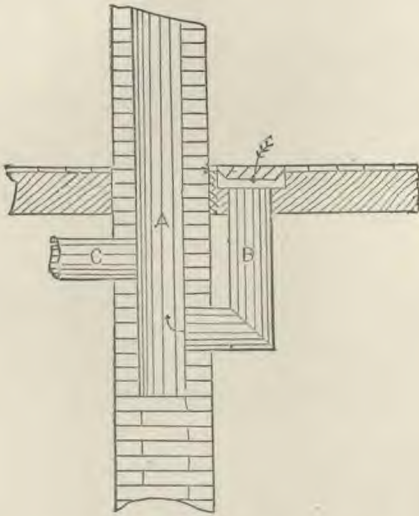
Ventilating a church by connecting an opening in the floor with the main chimney flue, making the connection below the entrance of the Furnace Pipe. A. Chimney Flue. B, Ventilation Tube. C, Position of Furnace Pipe.
